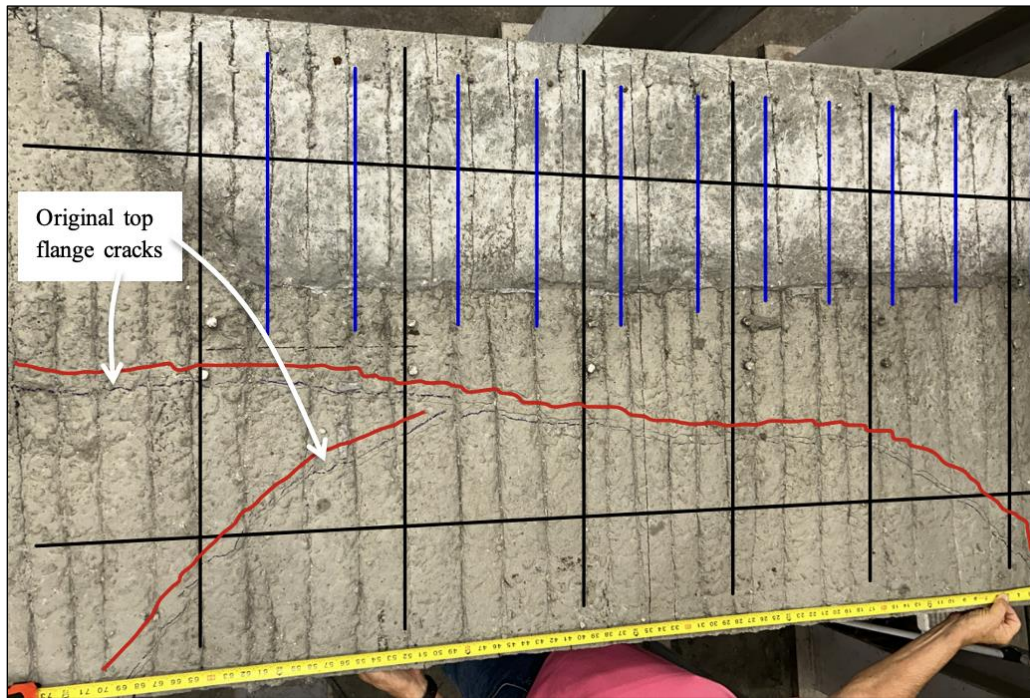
Photo. Test 1.2.F (repair 1.2LTF) overall final top flange crack pattern at maximum 31.4 kip.
